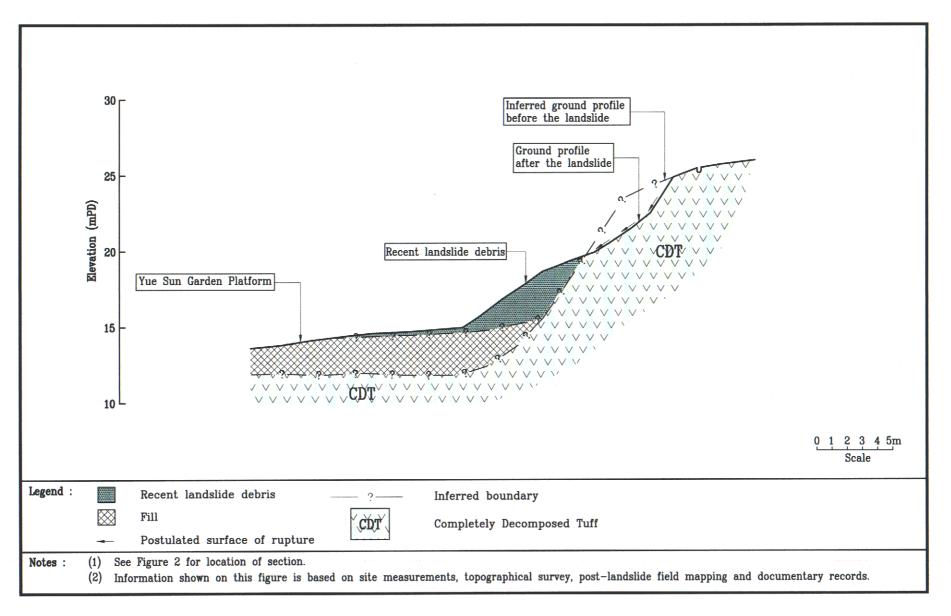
Section Showing the Inferred Ground Conditions at the First Landslide Site
